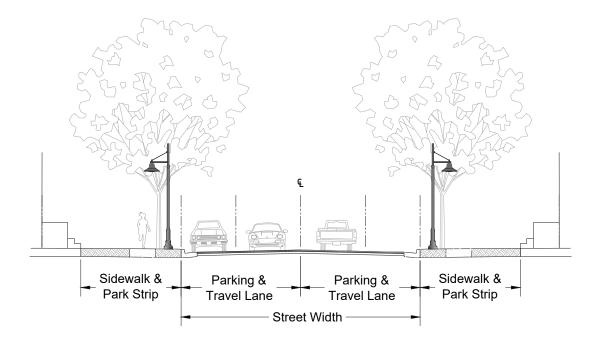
Typical Local Street with Non-Continuous Pedestrian Lighting Cross Section
